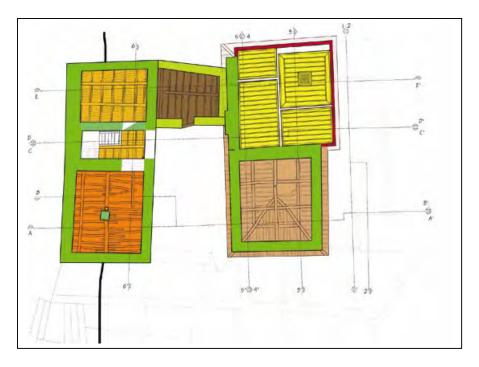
Mapping of material and construction systems on ceiling plan at +4.00
